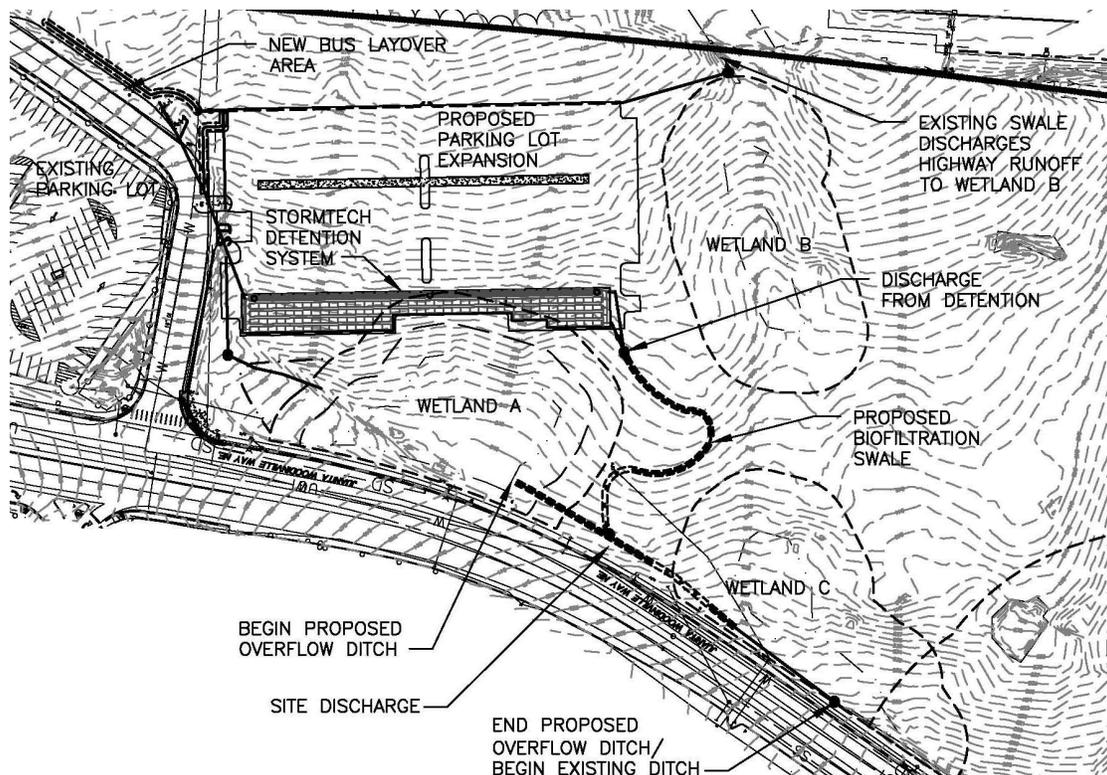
Site plan and conceptual drainage at Brickyard Park and Ride
